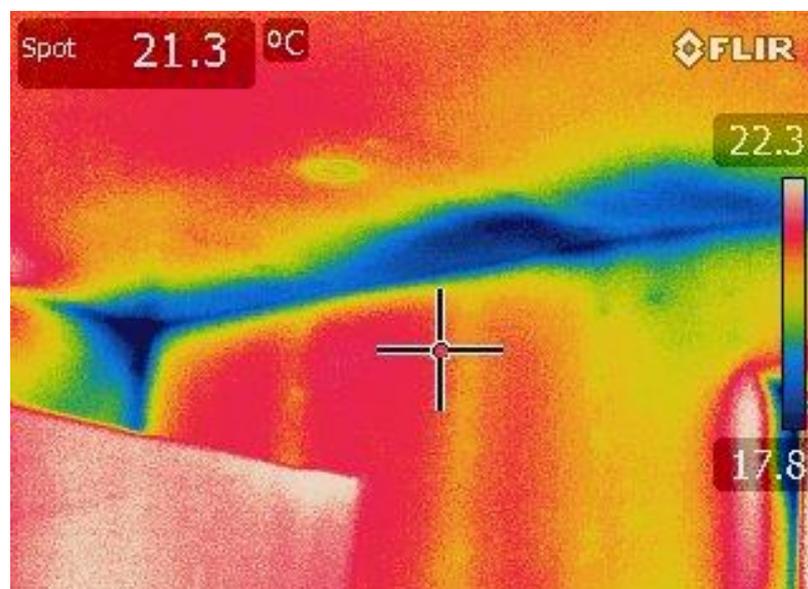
Ceiling of Ground Floor Kitchen Phase 1 Heat Loss
